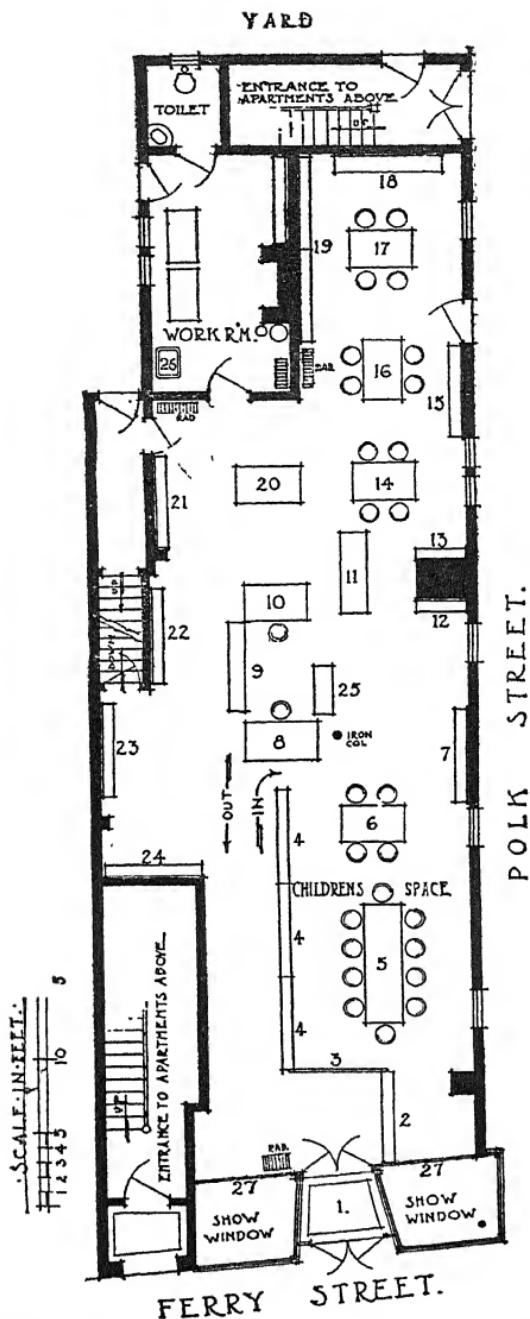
Key to floor plan on opposite page. Ferry Street Branch Library. Dimensions of room, 22' x 65'.
